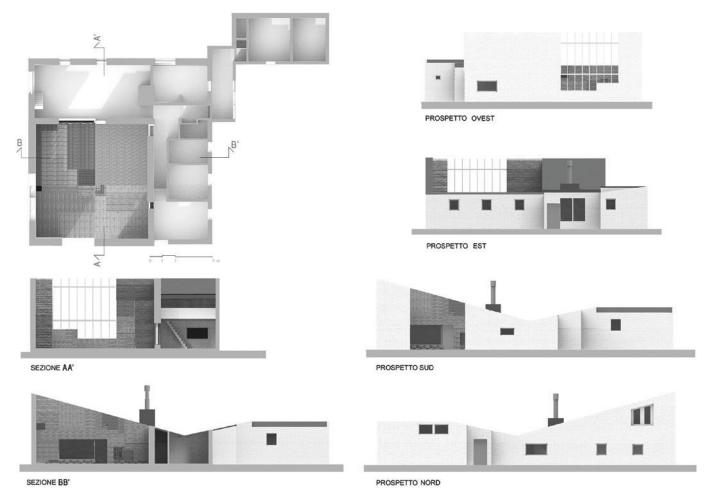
Plan, sections, and front views elaborated for Muuratsalo House by Alvar Aalto. Source: images created by the authors.
